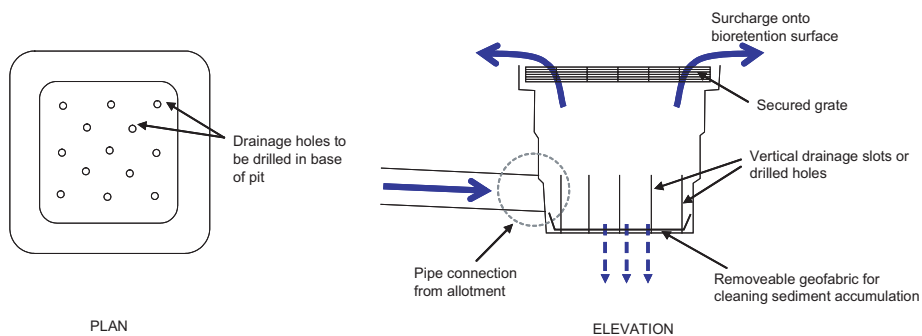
A surcharge pit for discharging allotment runoff into a swale.
